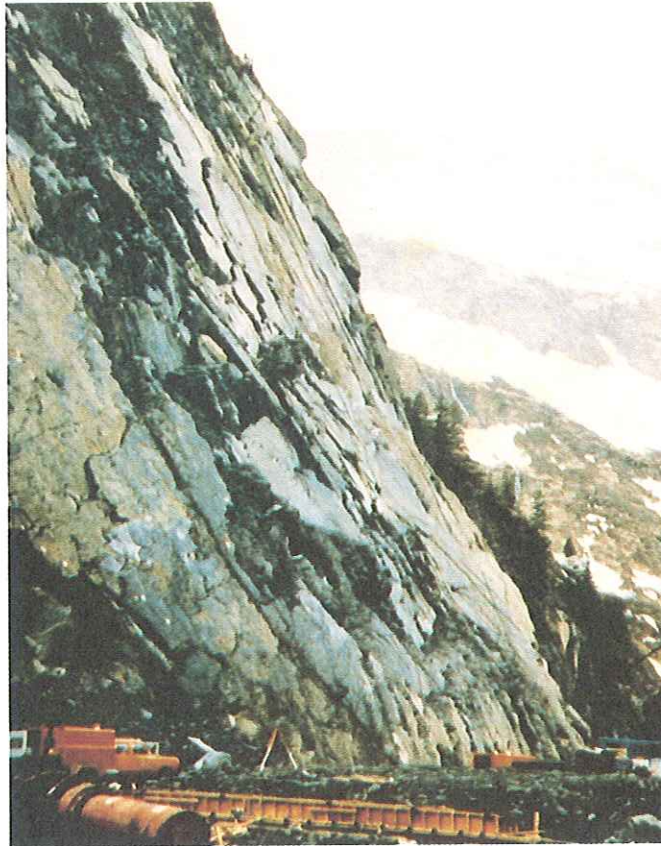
Rock slope after completion of excavation to the dip slope. Controlled blasting was used, loose rock was scaled, some rock bolts were installed, and drain holes were drilled into the rock. A wide catch ditch was developed.
